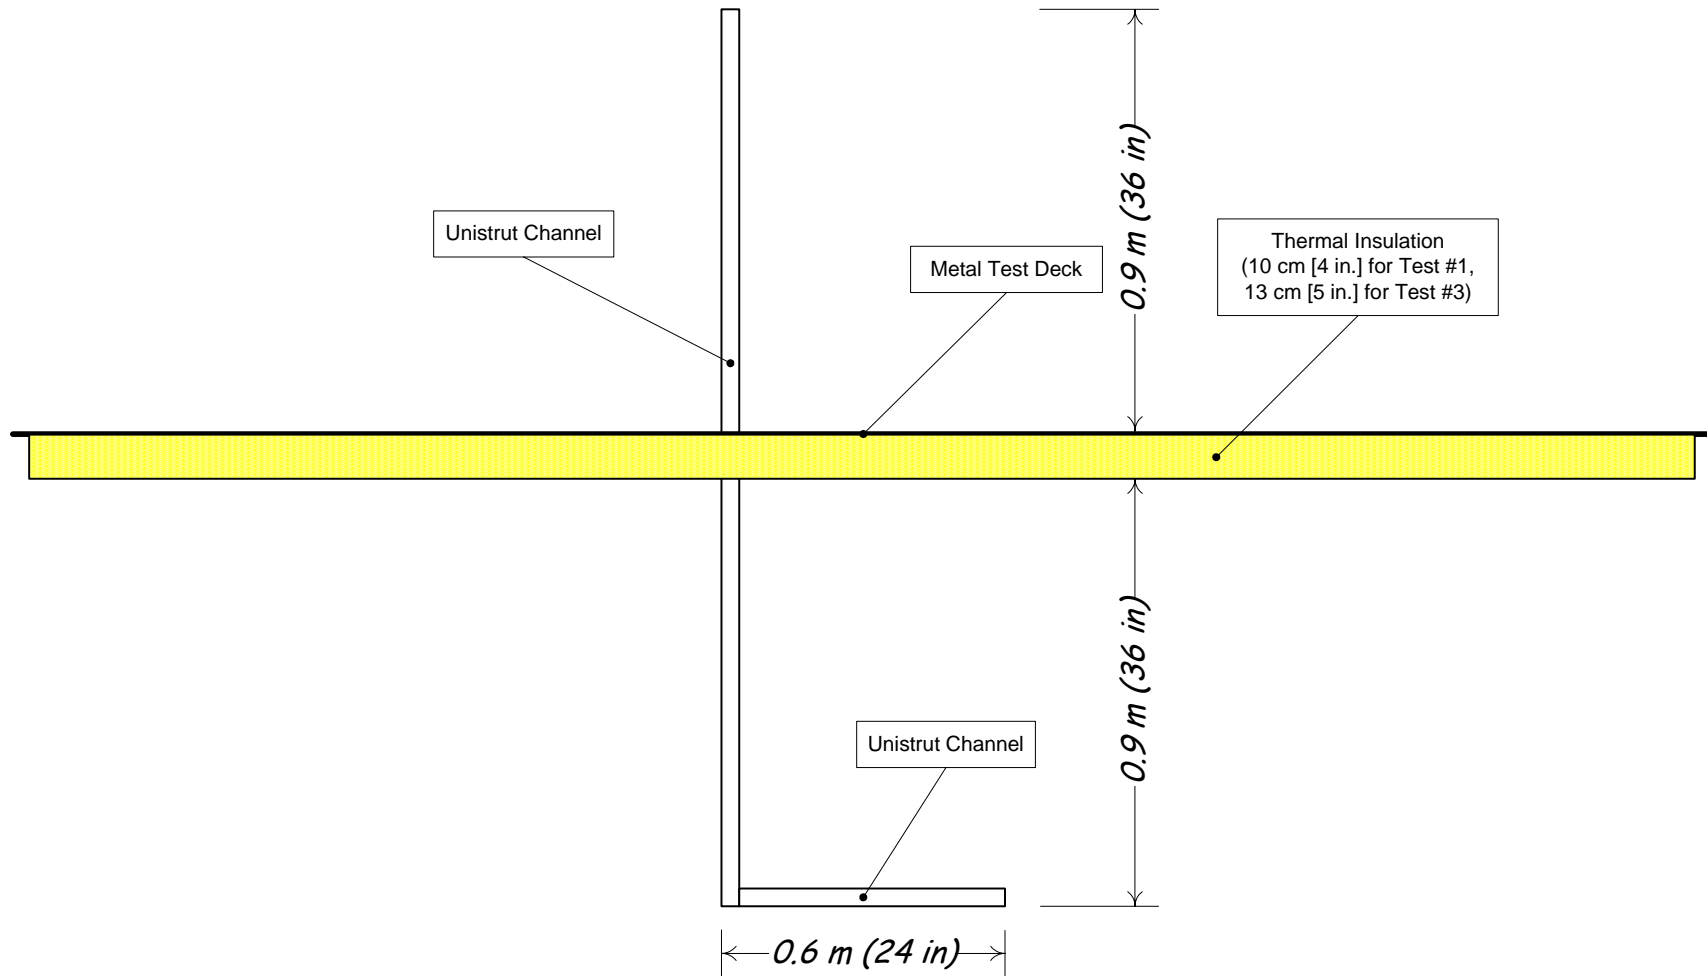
Unistrut® support structure test specimens (side view with dimensions).
